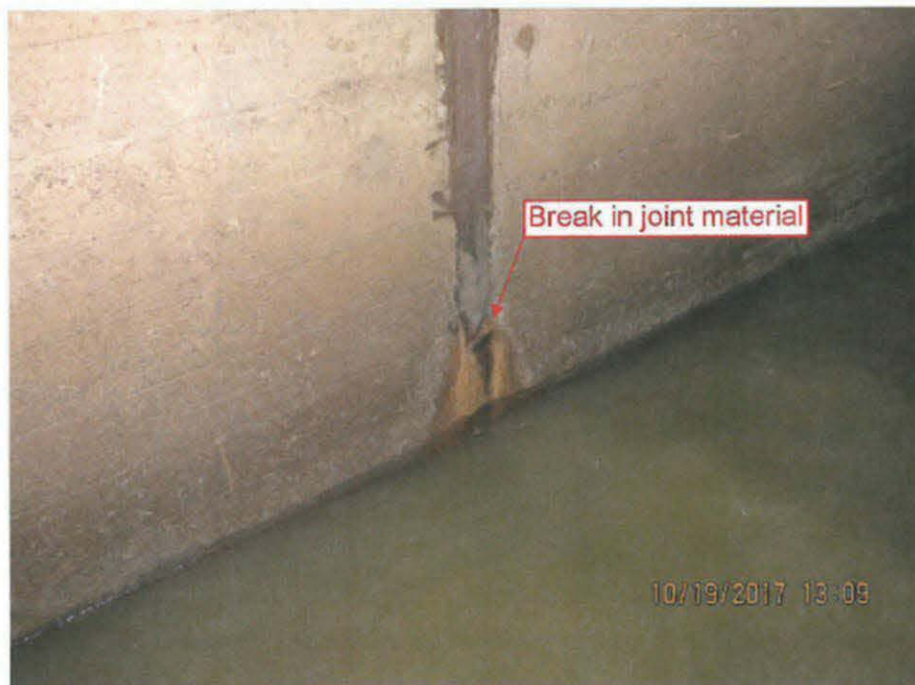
JOINT DAMAGE TO 3RD DOWNSTREAM JOINT OF BARKER OUTLET CONDUIT #3.
